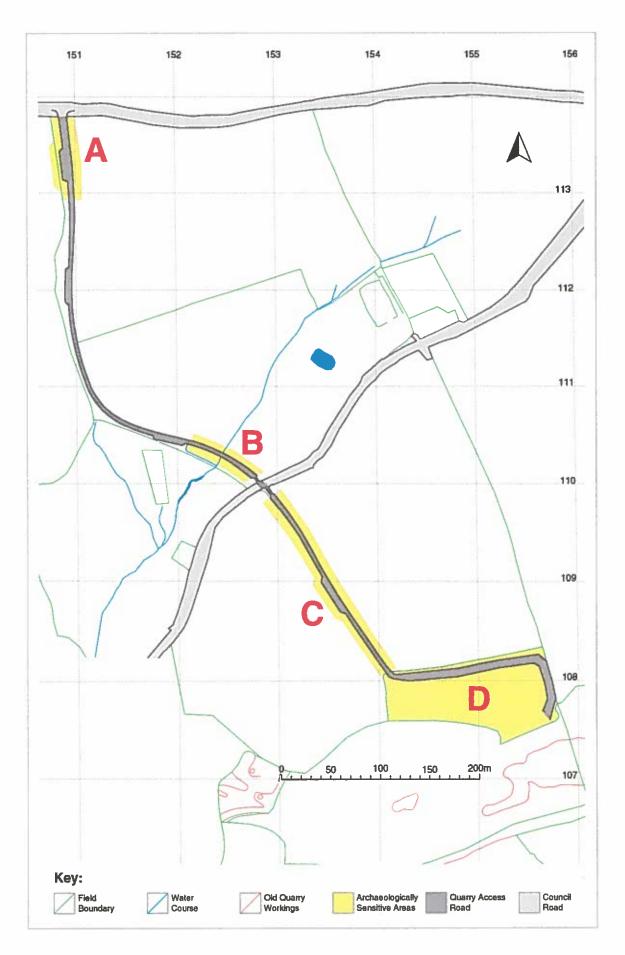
Plan Showing Quarry Access Road, Areas A-D
